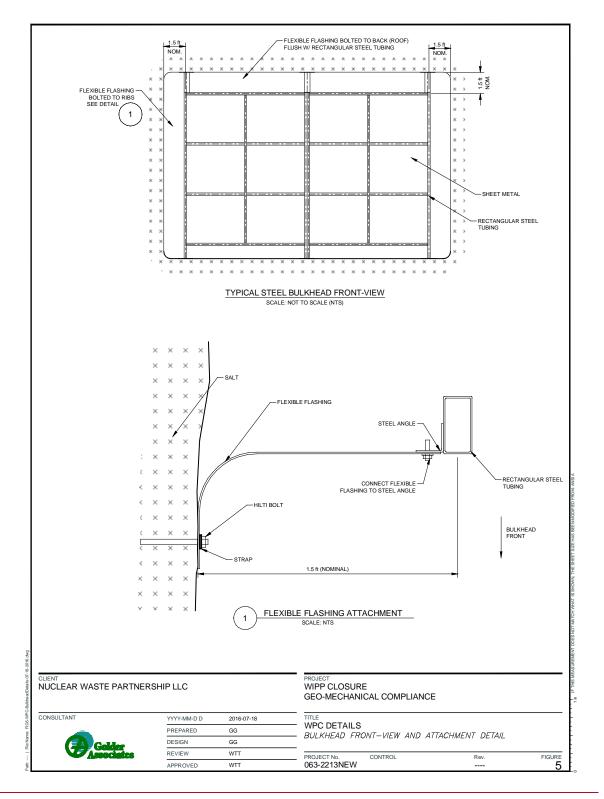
WPC Details – Bulkhead Front-View and Attachment Detail
